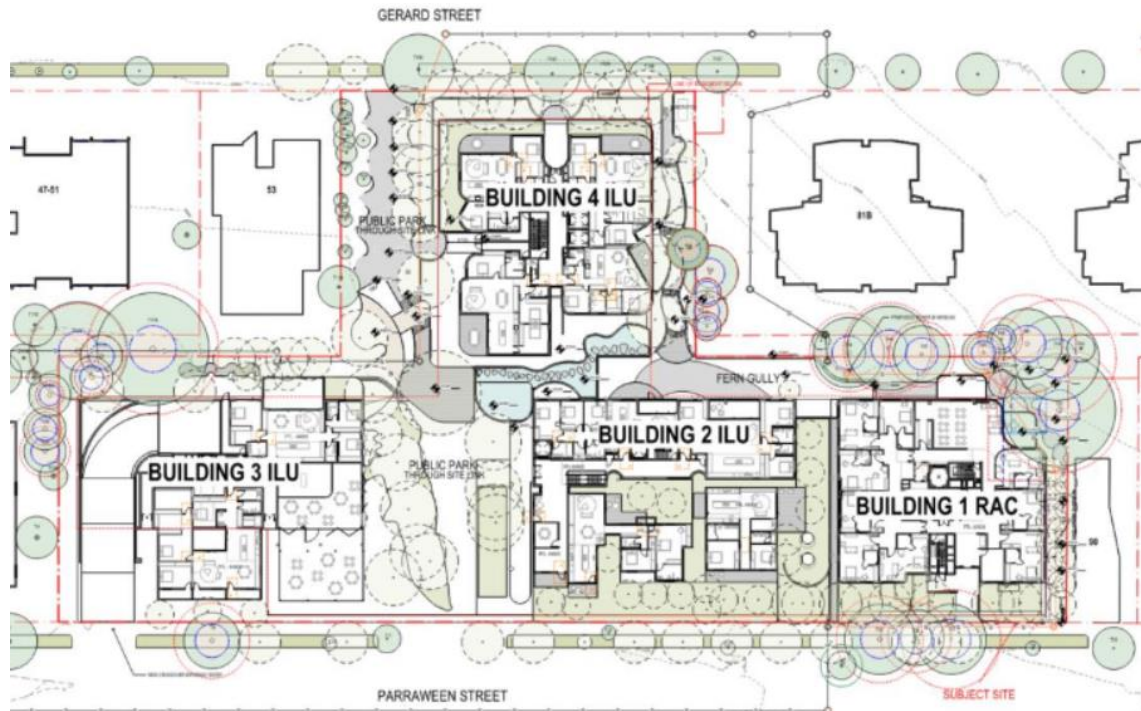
Architectural Site Plan (Entec Consultants, 2023)
